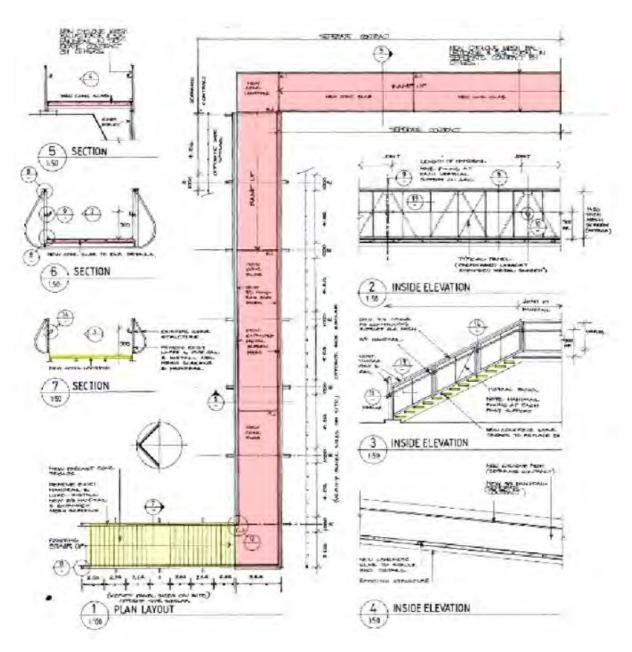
Modifications to Argyle Street footbridge in the 1990s showing the new concrete slab (red) and concrete stairs and landing (in yellow). (Source: Transport, annotated by GML)
